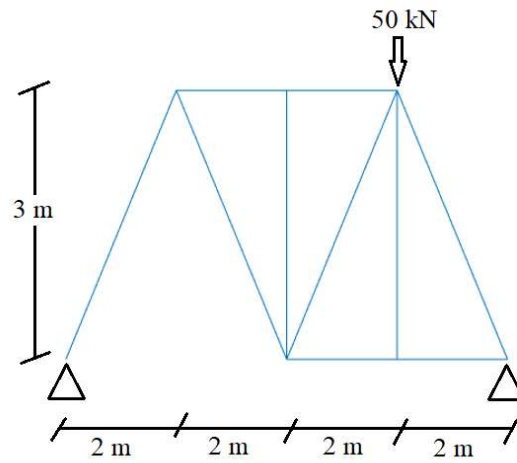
Optimal Truss Structure of Twenty-One Elements Truss Subjected to Third Load Case
